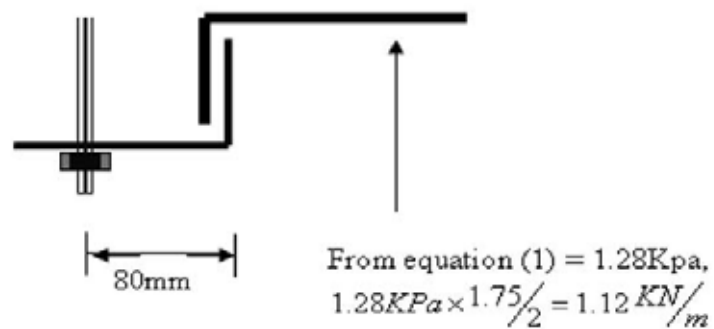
Pressure acting against louvre, bracket, and concrete.
